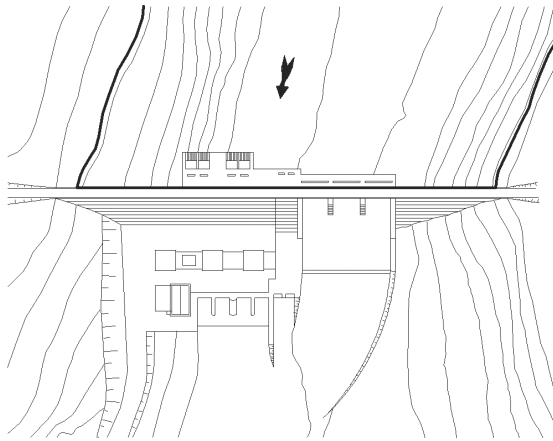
Typical layout for a narrow river valley.
